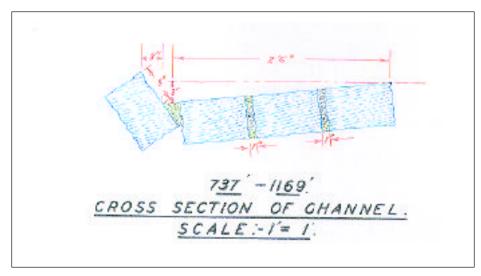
Engineering Drawing, reconstruction of Beresford Street from Trafalgar Street to Mont Albert Road, Mont Albert, 1937, City of Box Hill, "City of Whitehorse".
